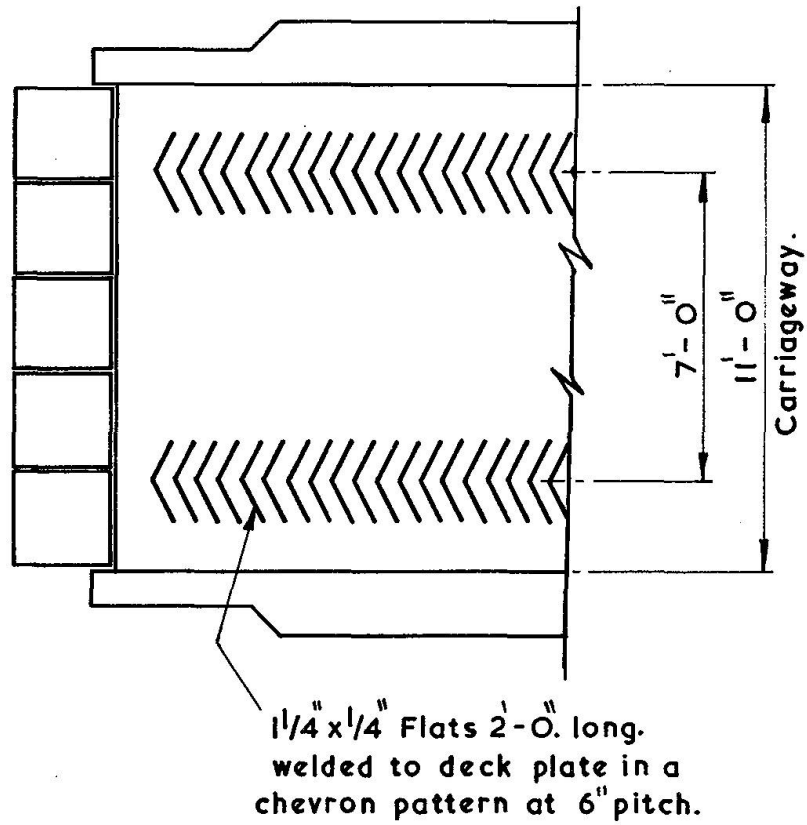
REINFORCEMENT AT END OF RAMPS.
